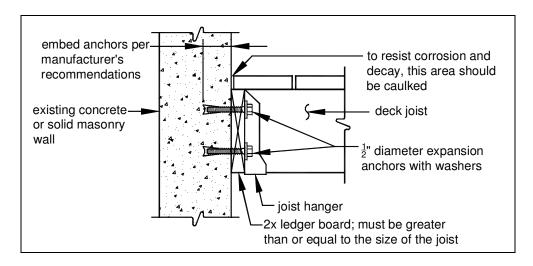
ATTACHMENT OF LEDGER BOARD-TO-FOUNDATION WALL (CONCRETE OR SOLID MASONRY)
